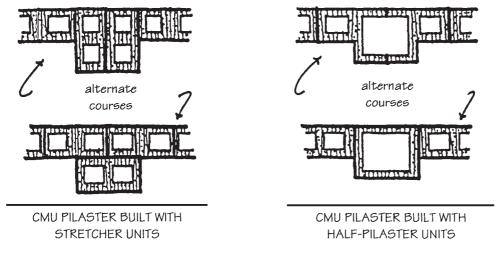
Unreinforced columns and pilasters for lateral support of empirically designed masonry walls.
